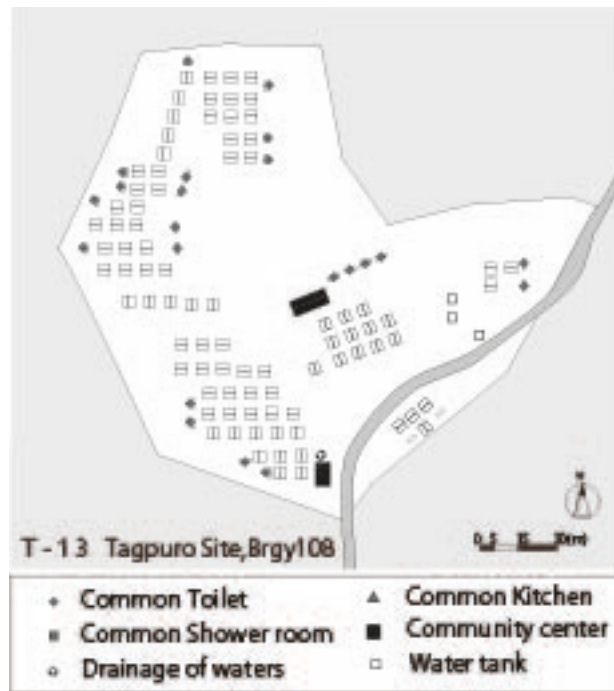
16: Site Development Plan of T13 – Tagpuro
